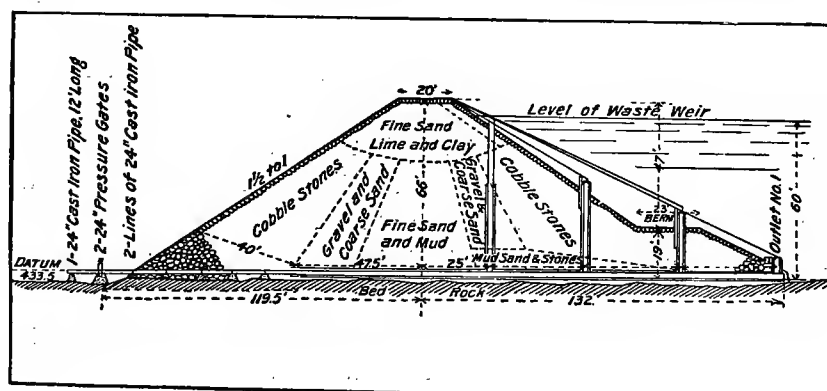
CROSS-SECTION OF LA MESA DAM.
